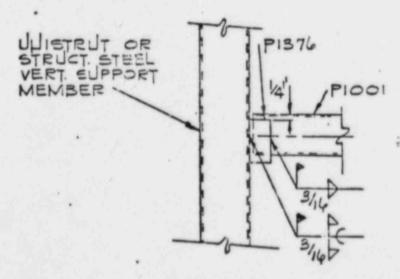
TYPICAL HORIZONTAL TO VERTICAL STRUCT. MEMBER CONNECTION
